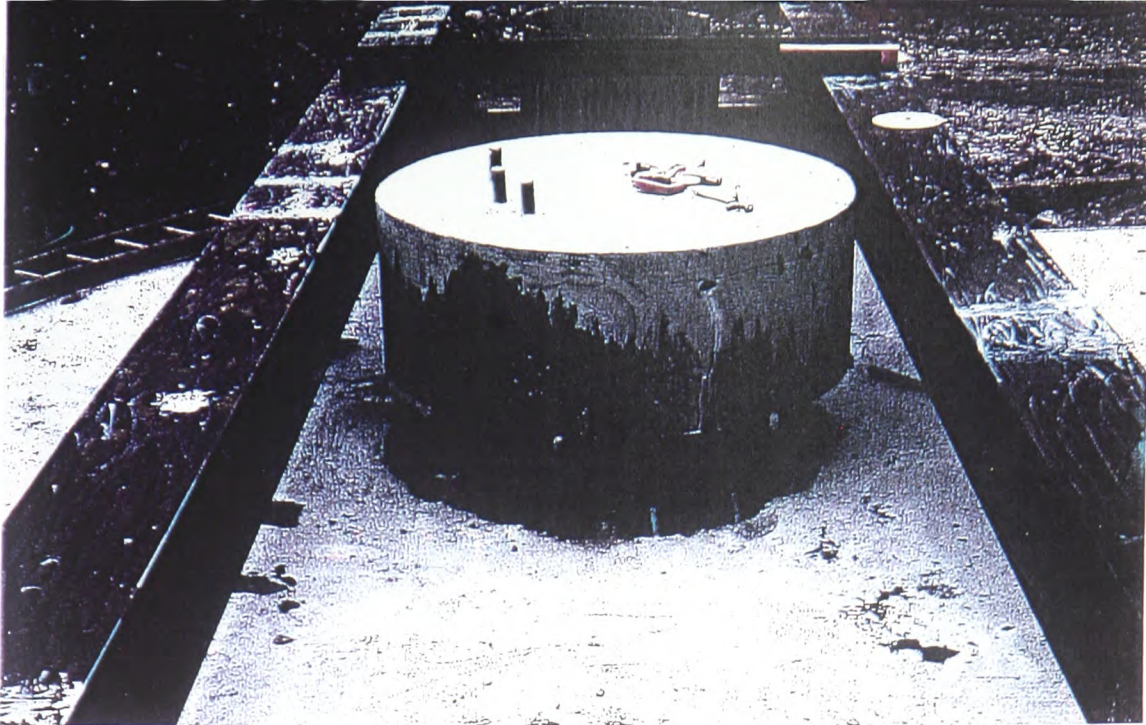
Completed test pile with one of the reference beams on which the pile head movement measuring gauges are mounted
